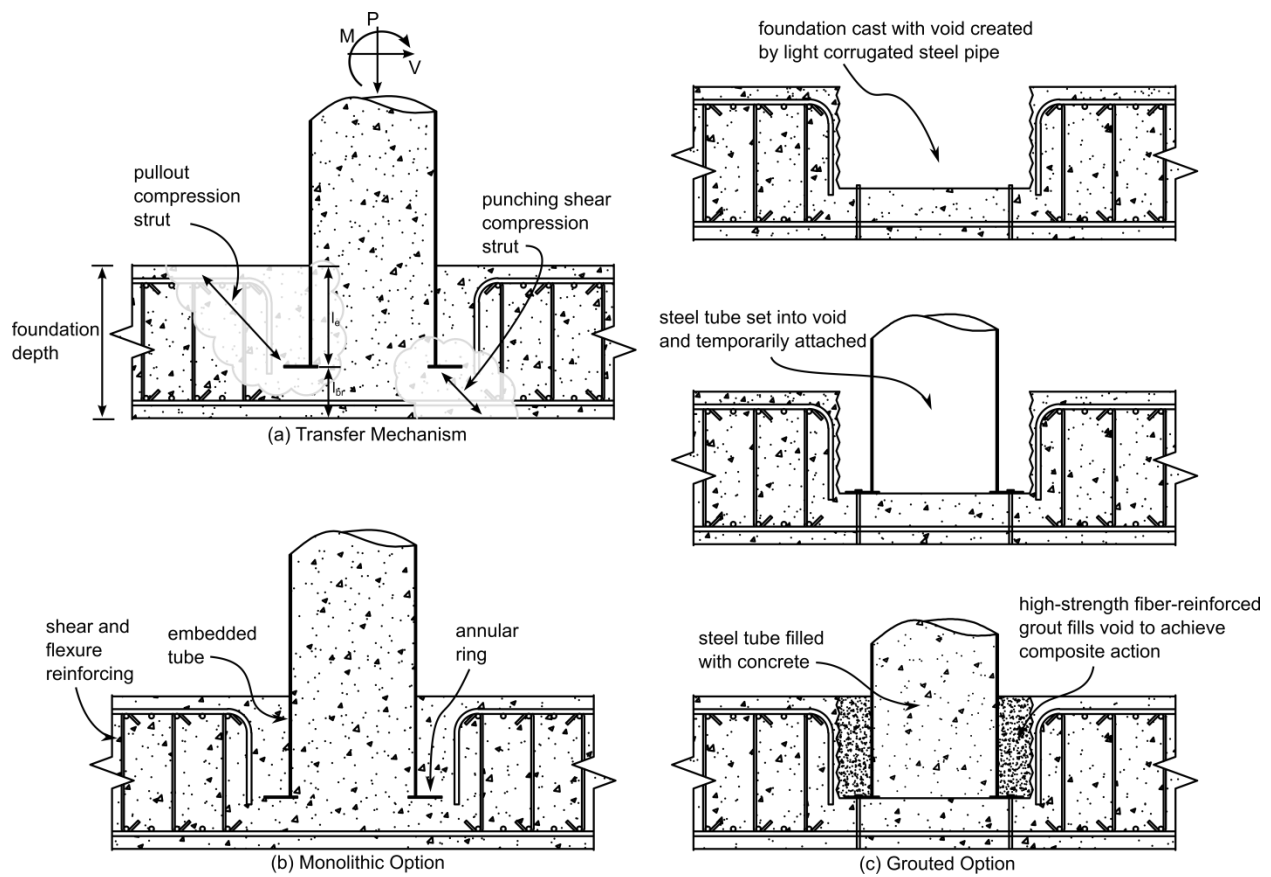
Foundation Connection Proposed at the University of Washington
